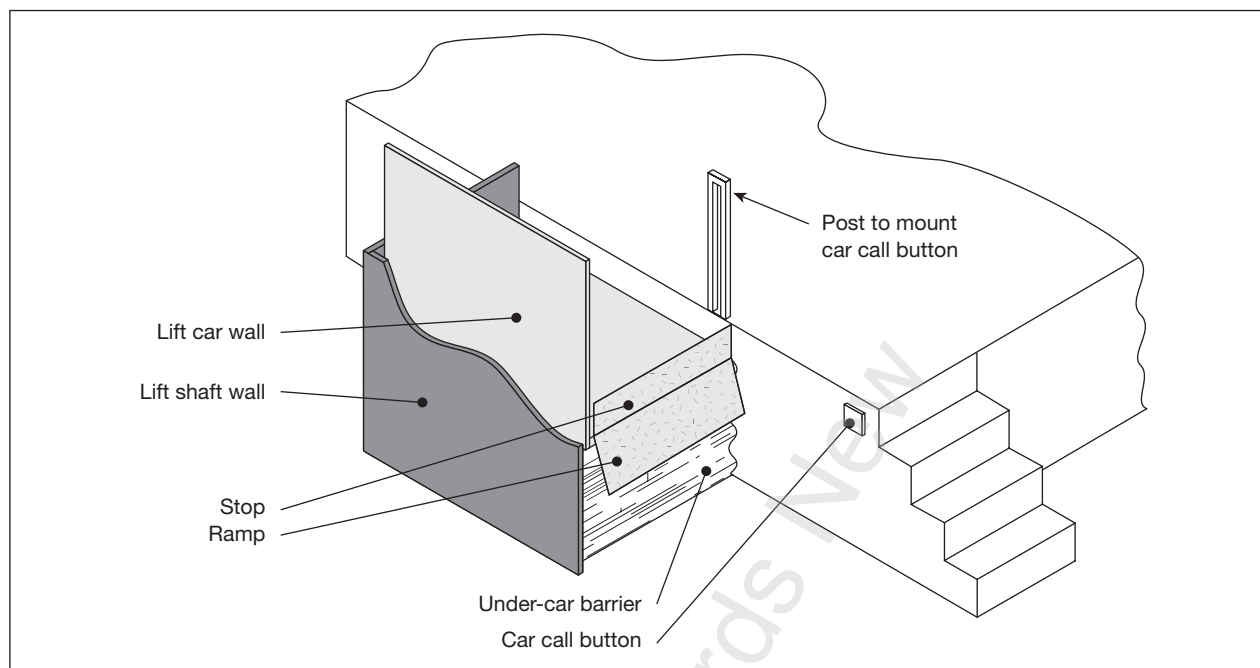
Example of an open platform lift with travel distance less than 1 m
